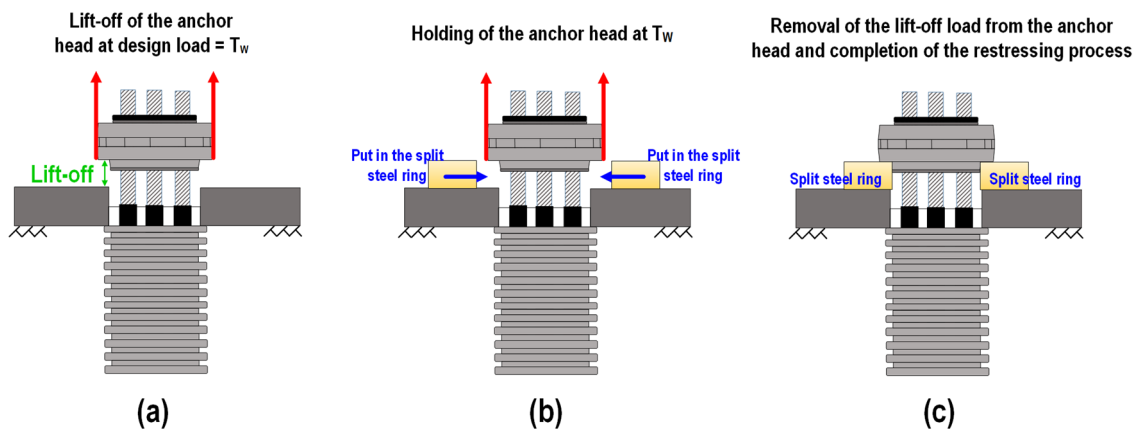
Restressing of an existing anchor in the modified lift-off test: a lift off of the anchor head at the design load, b holding off the anchor head at the design load and placing a steel split ring into the gap between the anchor head and the bearing plate, and c removal of the lift-off load from the anchor head and the completion of the restressing process
